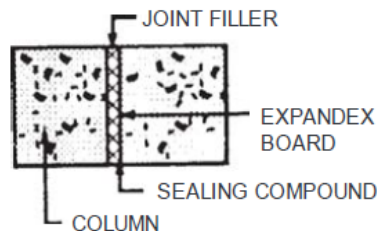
Typical Details of Expansion Joint at Isolated Twin Columns
